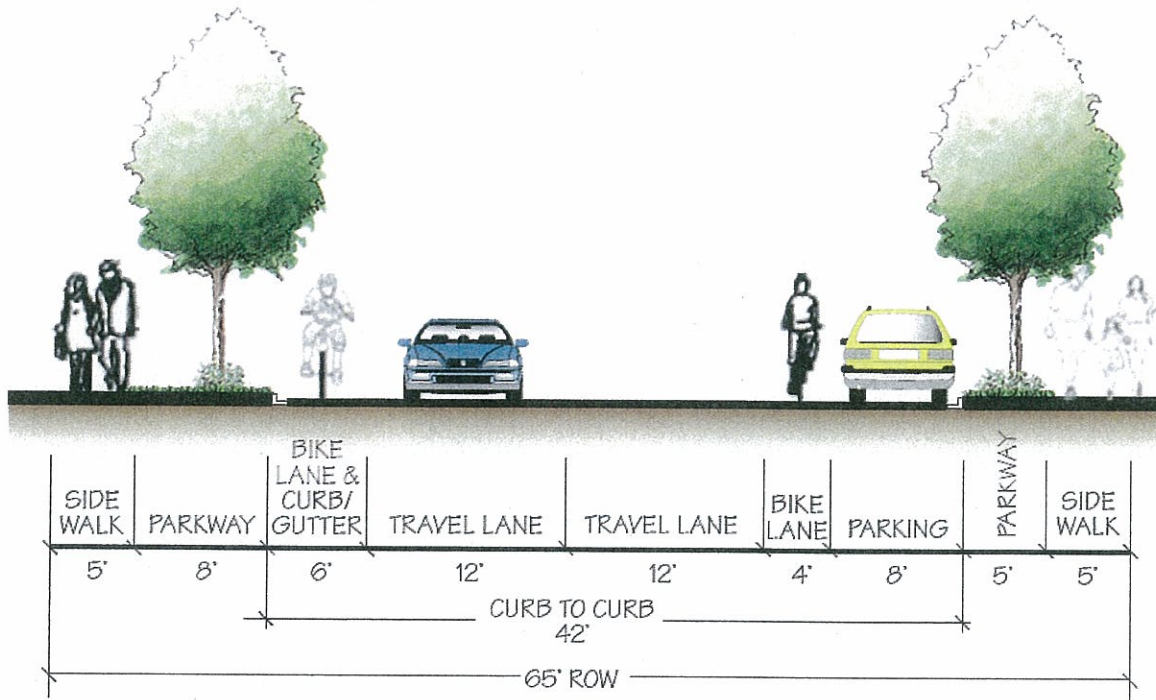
Herdal-Werner Connector Segment 1 (Section A-A from Figure 5-1)
